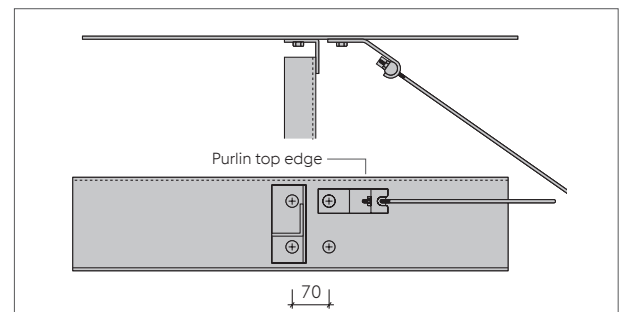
Detail of jointing a strut and a diagonal tie to the purlin in an inner braced bay
